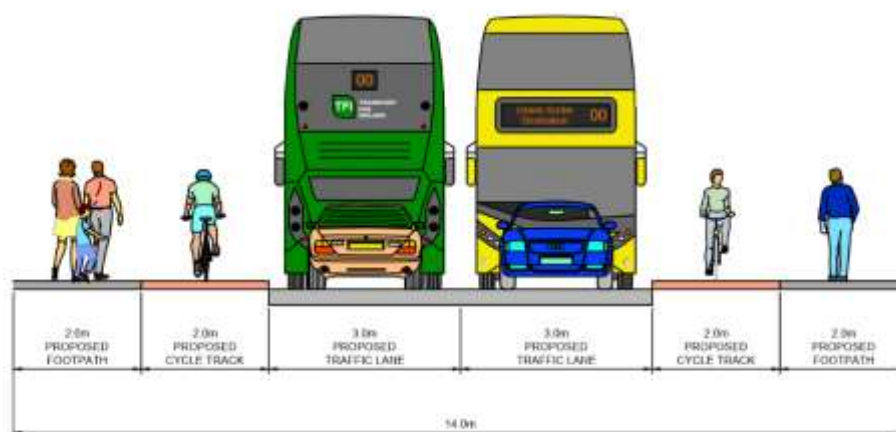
Typical Traffic Management Cross Section (C-C)
